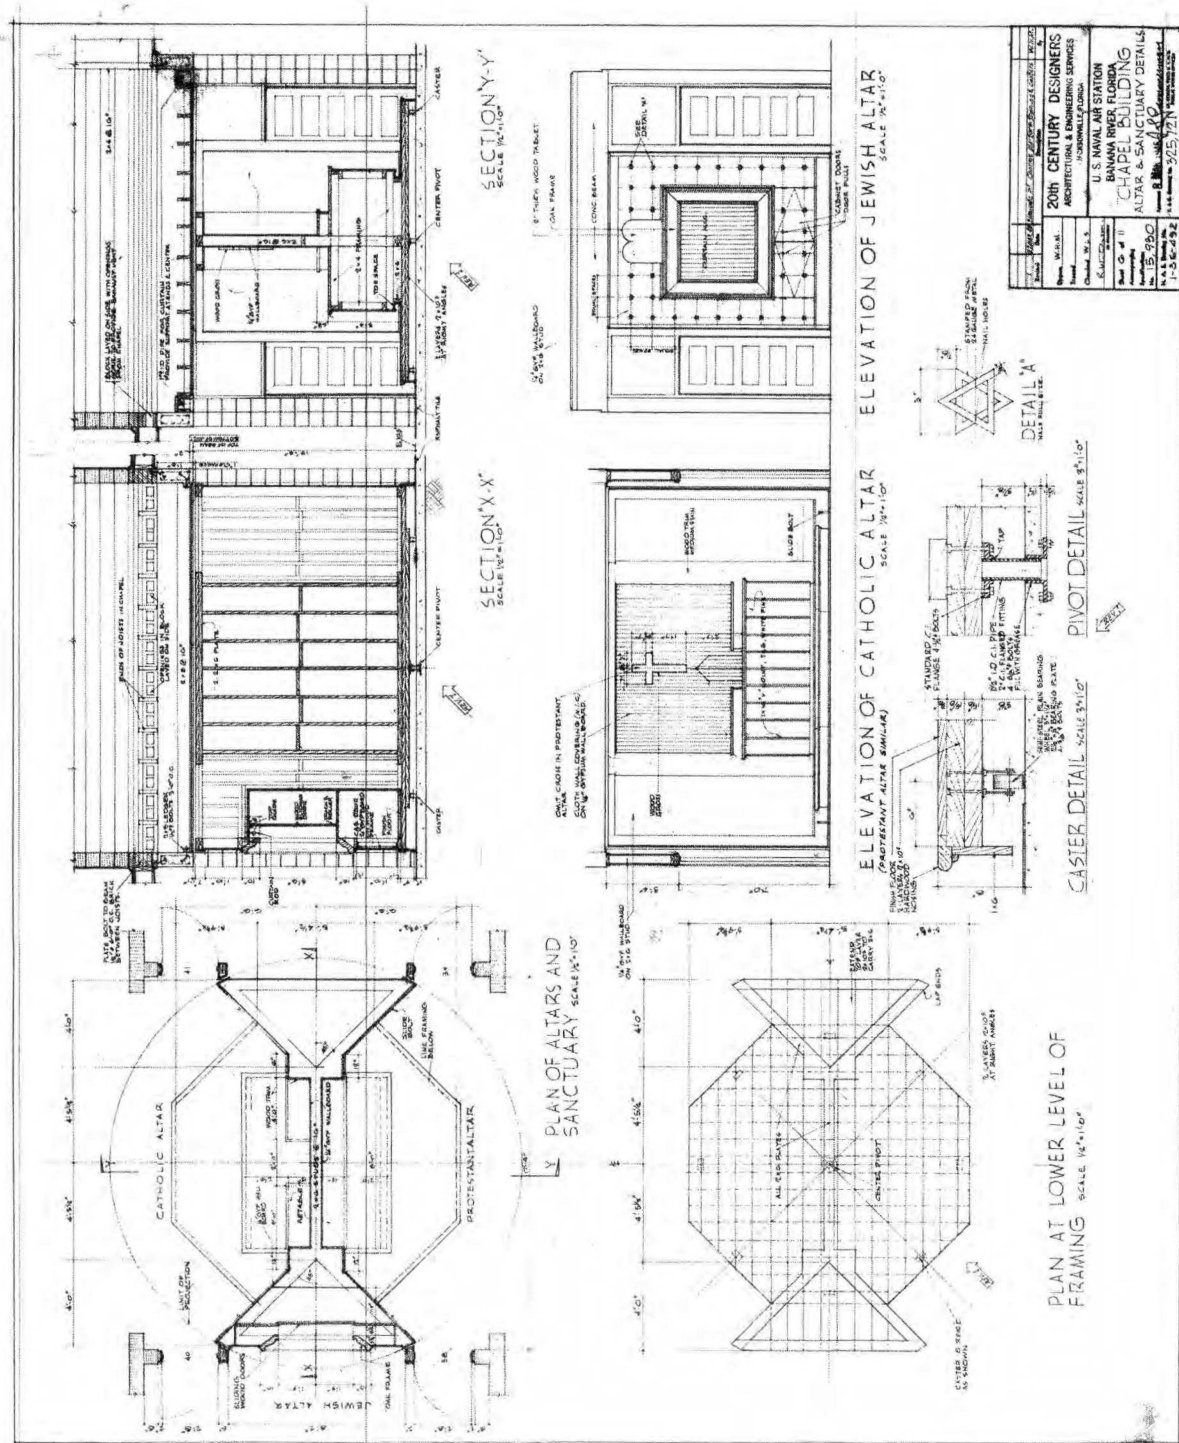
Altar and Sanctuary Details, Chapel Building, U.S. Naval Air Station Banana River, Florida, 8 March 1945.
